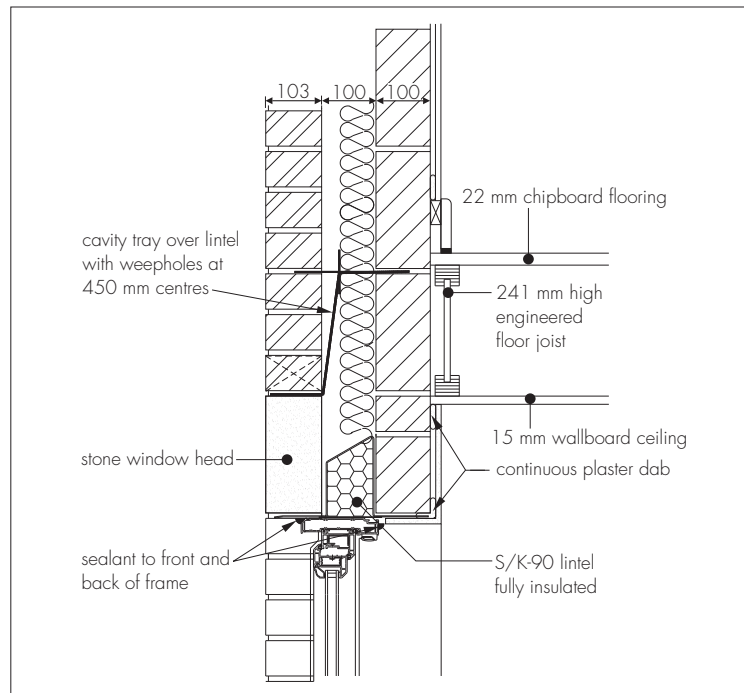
Installation detail — S/K-90 (100 mm cavity/partial fill)
